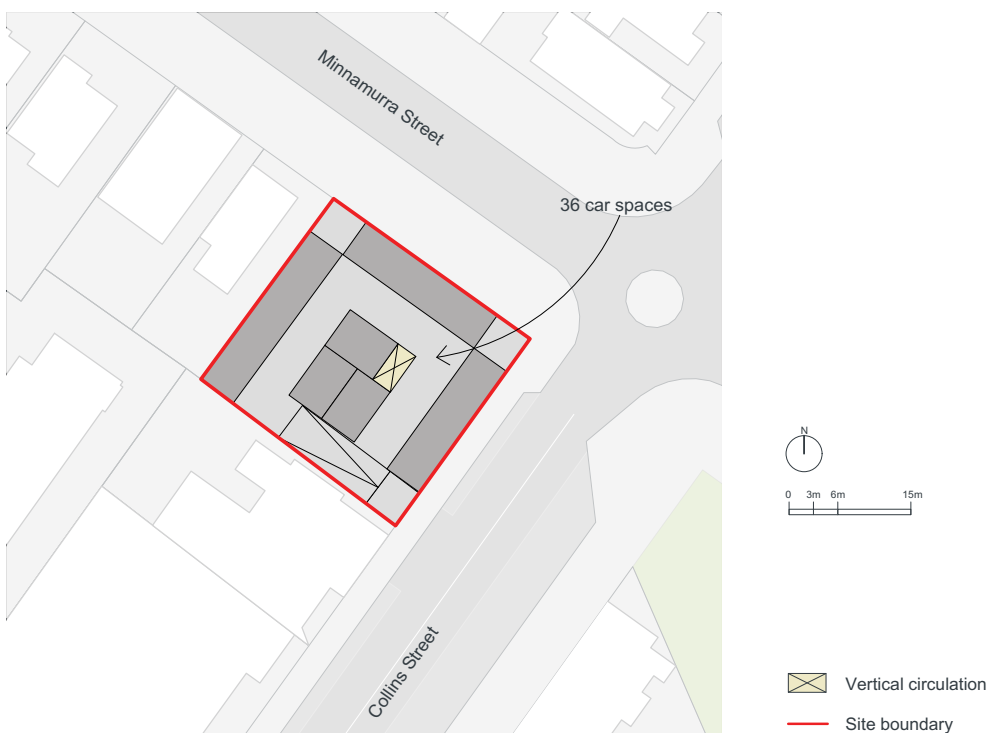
Corner site at Minnamurra & Collins St - Basement 1 Plan
